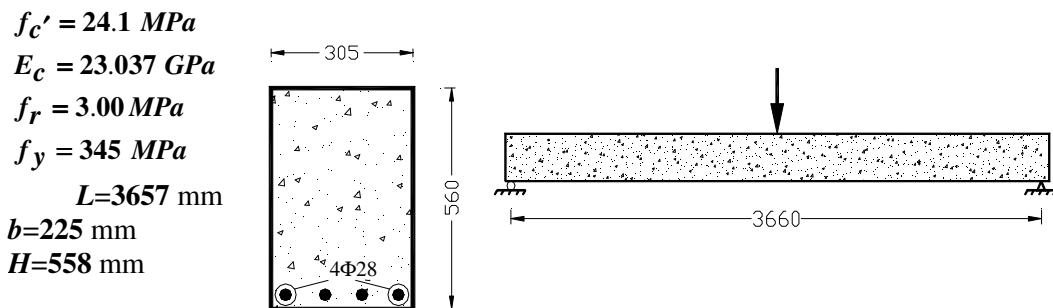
Details of a reinforced concrete simply supported beam under concentrated load at mid span with $(L/H=6.55)$ (kreshna)
